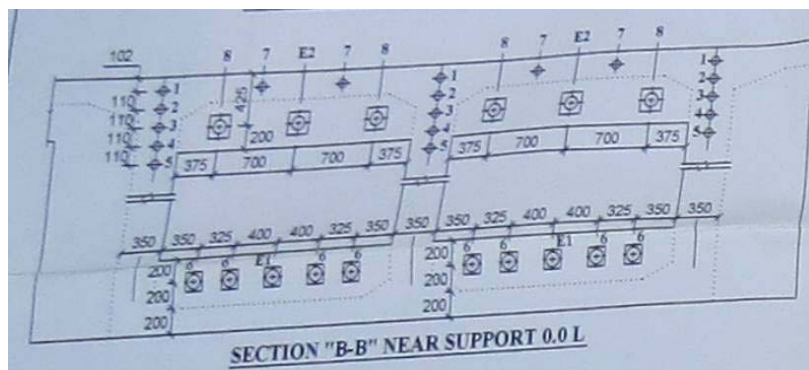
Portion of working drawing showing cross section of main span and curtailment of cable VIII at 0.
